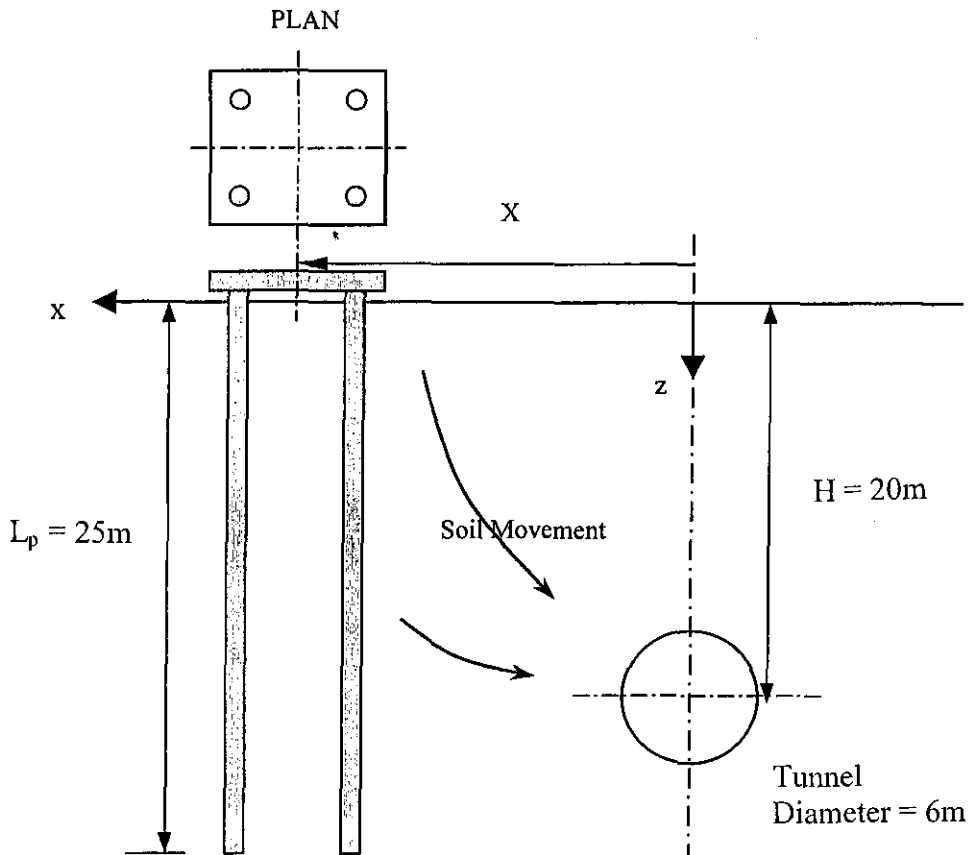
Pile Group Adjacent to Tunnelling - Typical Problem Analysed
